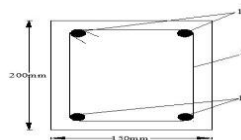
Cross section: 1 – Longitudinal rebars, 2 – close stirrups
